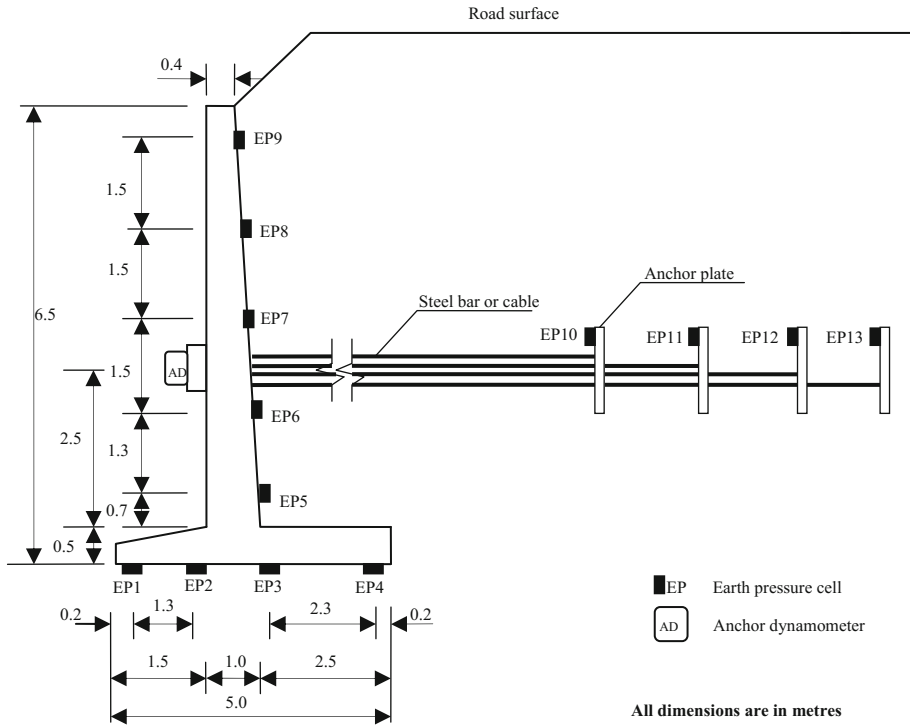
The structure and instrument locations of multi-anchored-plates retaining wall
